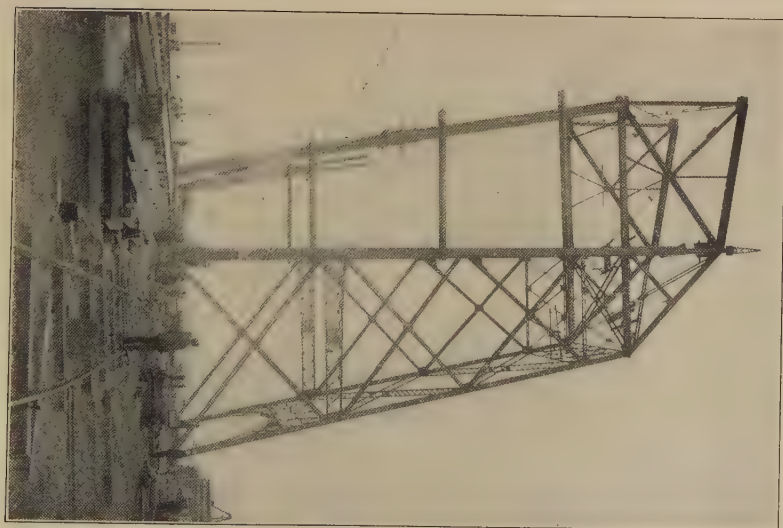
DULUTH FERRY BRIDGE, NORTH TOWER.
